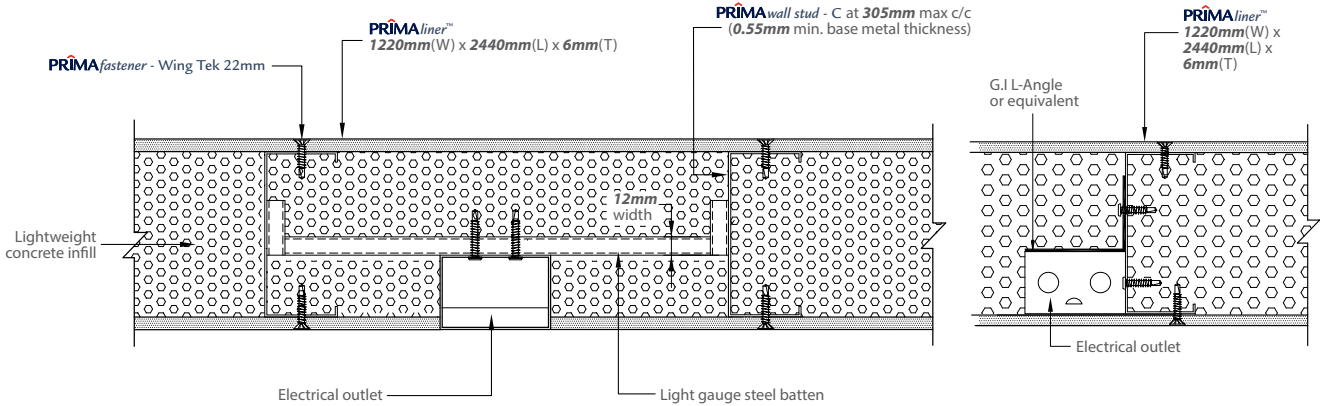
Electrical outlet in between section C-C and electrical outlet attached to stud
